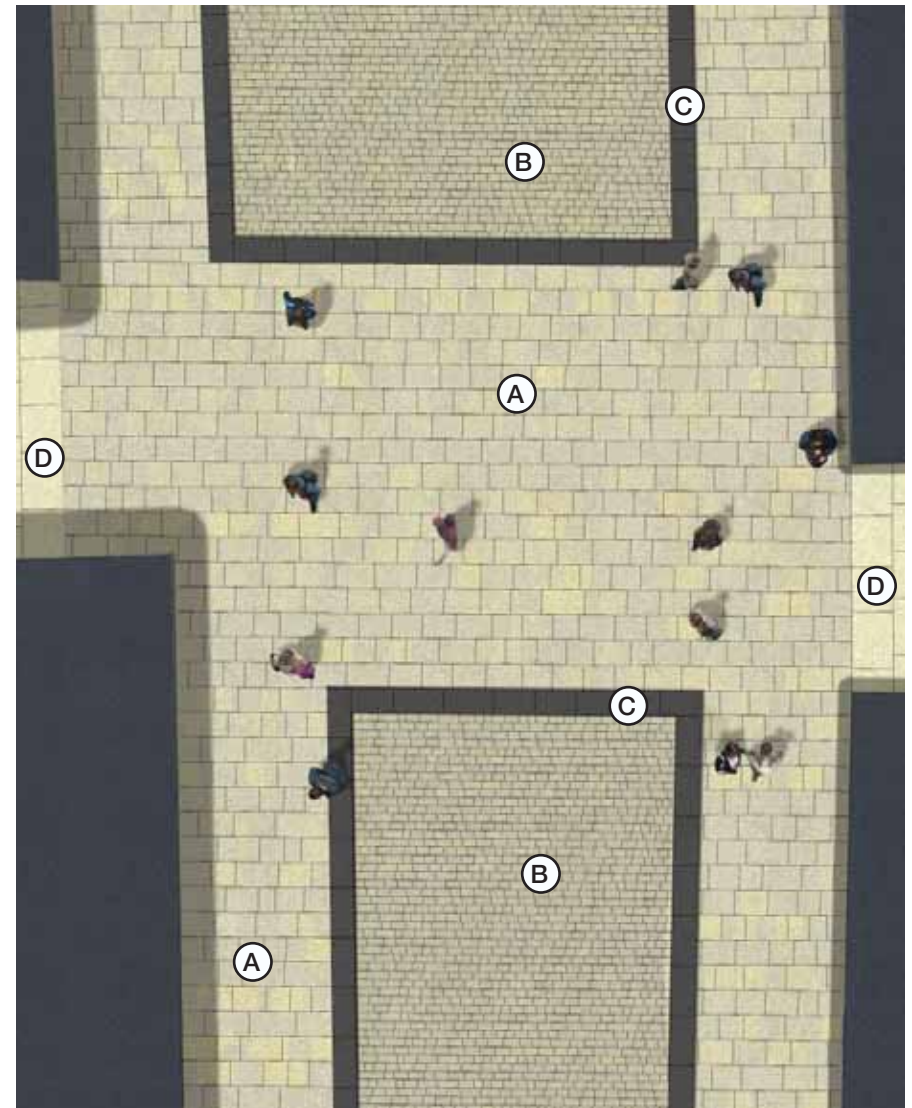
Concept sketch plan illustrating typical layout and materials of the street (Example Maidenhead Street)
